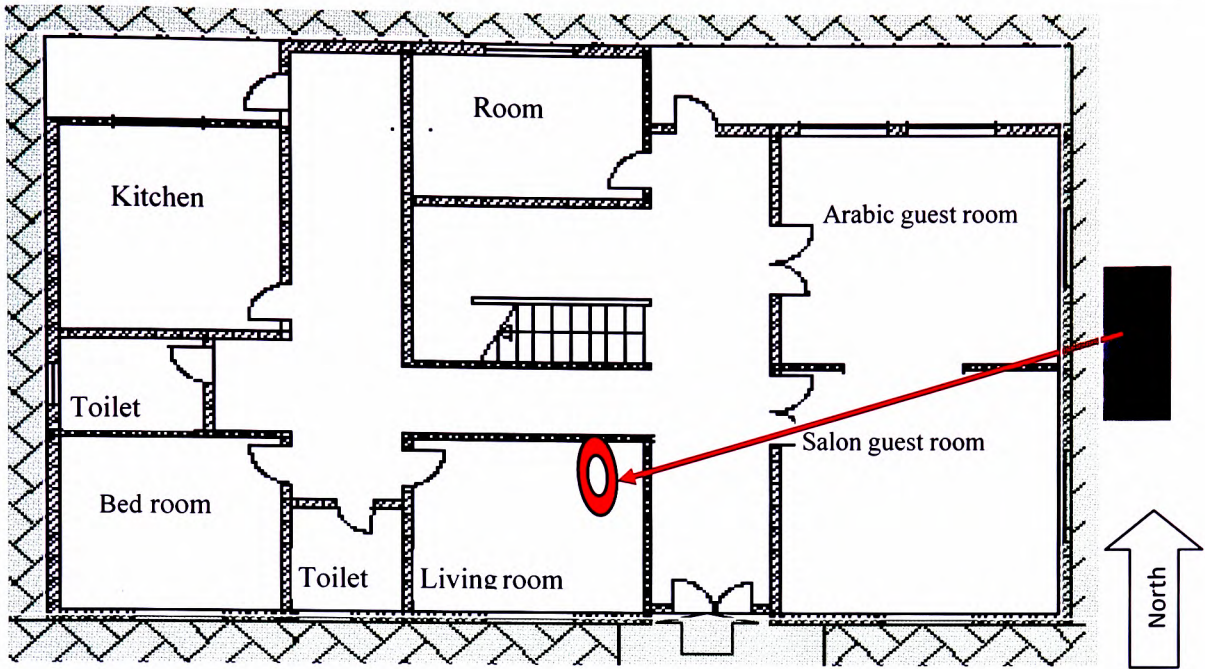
61: Ground and first floor plan showing the location of the sensors - Data Logger on the ground floor.
